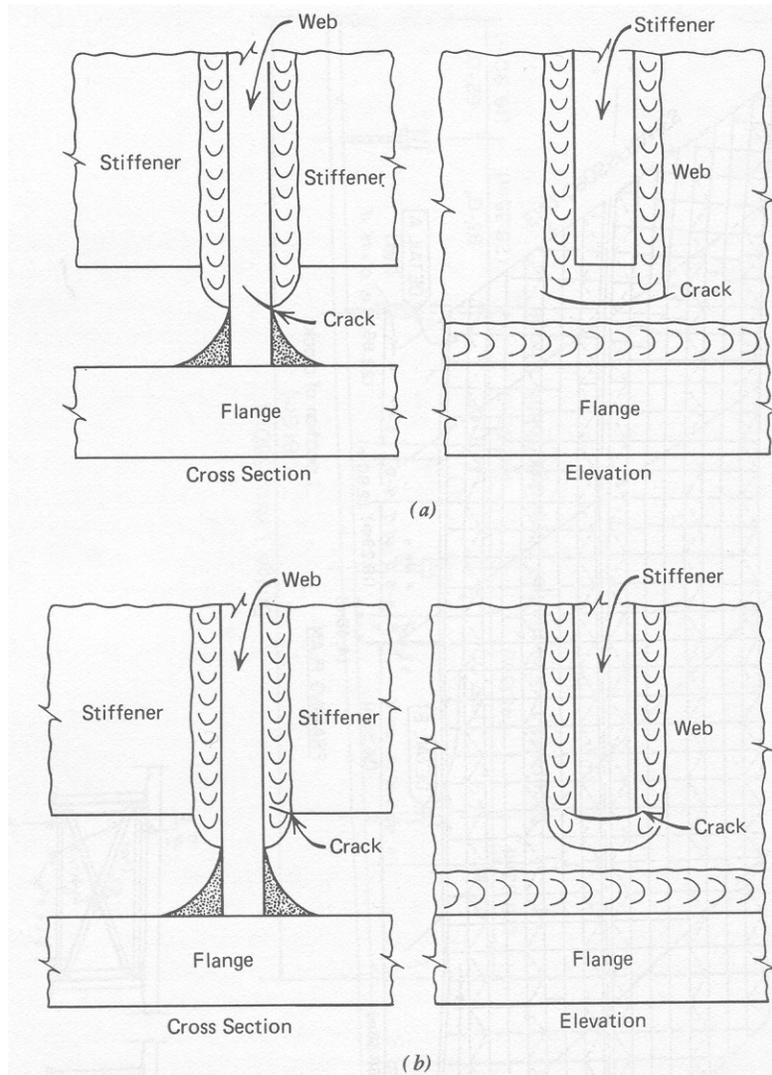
Transverse stiffener web gap cracks on the I-90 Bridge (Fisher 1984)
